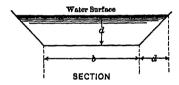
(Part 1 of 3) —Hydraulic Elements of Trapezoidal Sections
